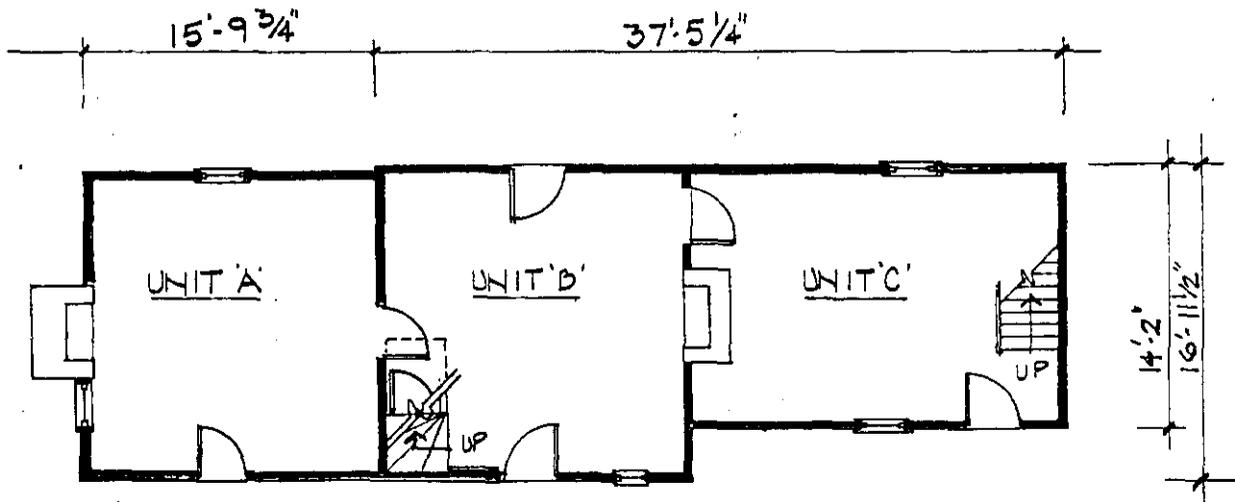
Exhibit A: First-floor plan of Maple Springs. Drawn by architect Peter Serafin.
